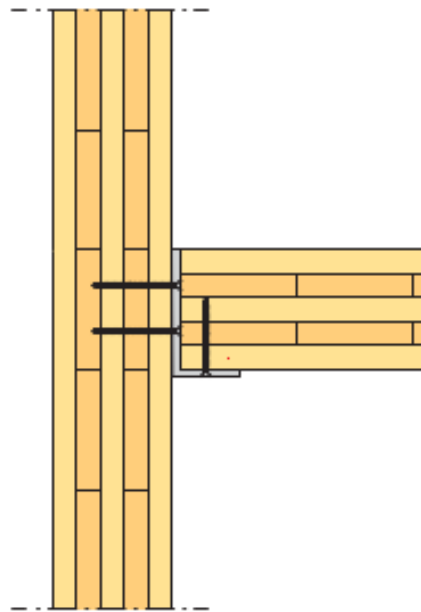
Connection between a CLT floor and wall designed to transfer vertical loads (Swedish Wood, 2017).
